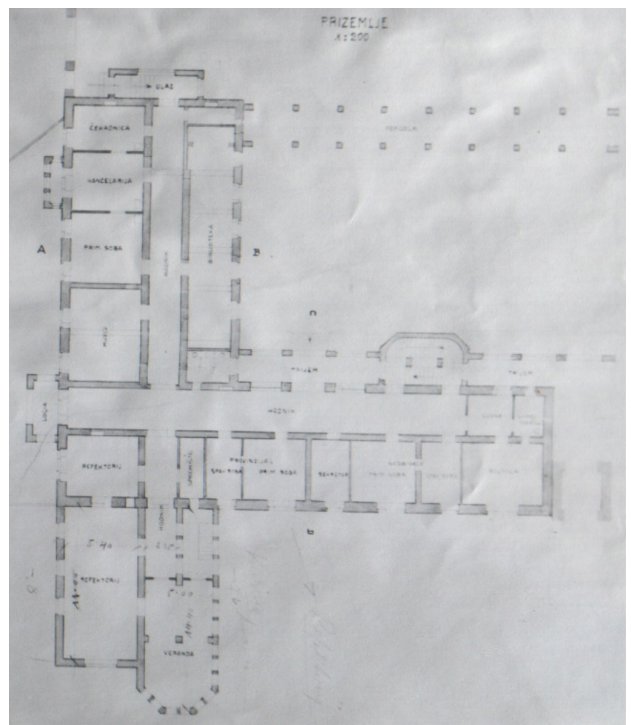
The Convent of Saint Luke the Evangelist, Jajce: floor plan of the ground floor, segment of the first proposed project done by Karel Pařík (Dimitrijević 104.e)
